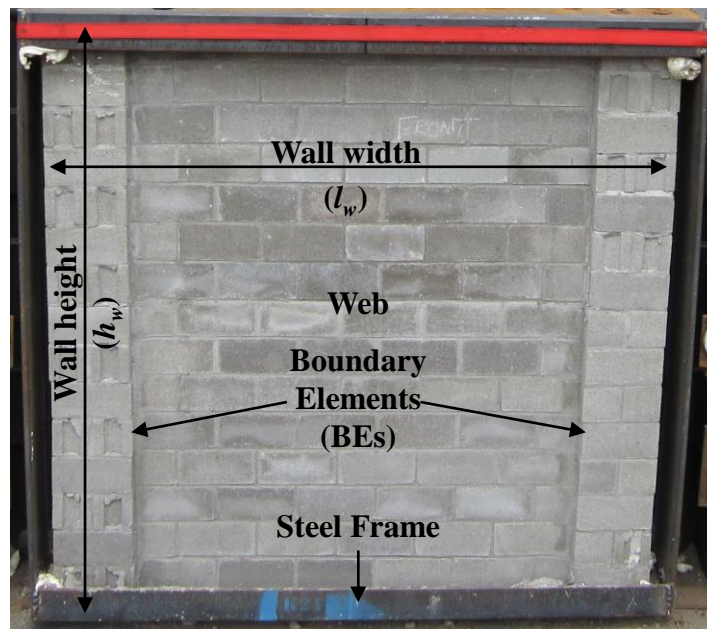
One-third scale wall specimen confined by steel frame forming the boundary condition
